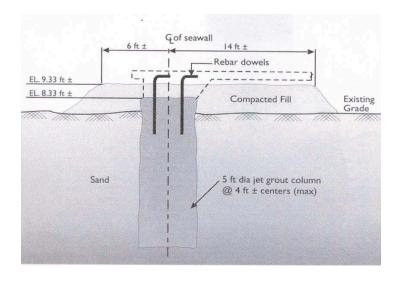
Cross section of jet grout scour barrier installed at Bally's Park Place Hotel and Casino
